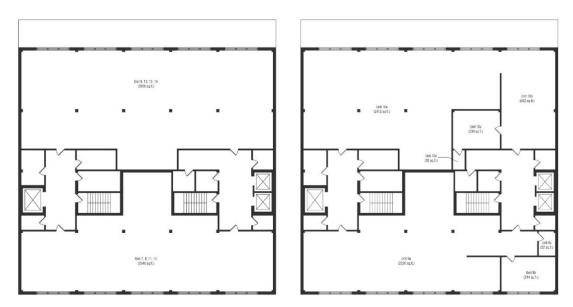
, 473 (left to right): Building 16, third floor (1914); same floor (1973); 1'' = 32'. North is down.
